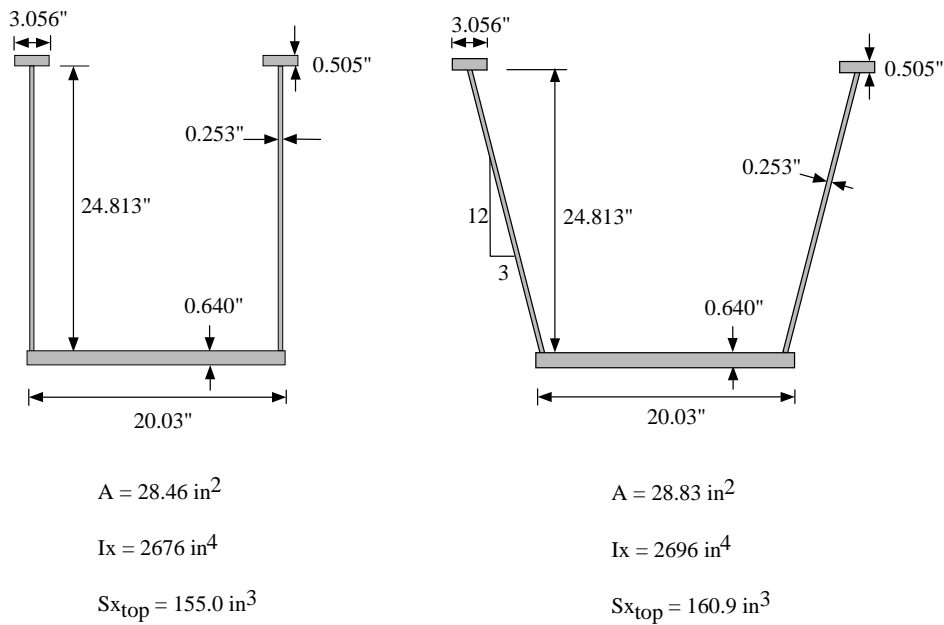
Cross-Section Properties of U-Girder Finite Element Models
